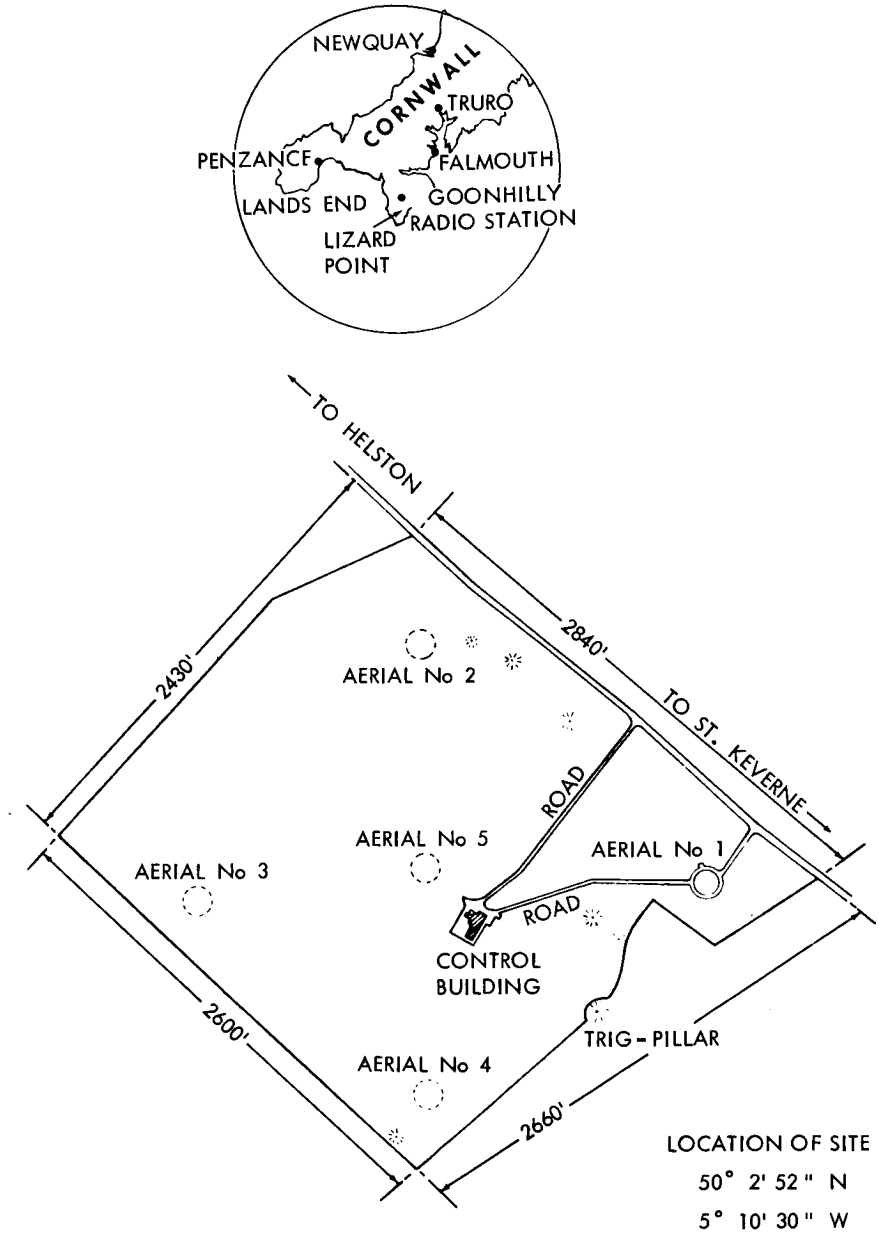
Simplified site plan, Goonhilly Radio Station.
